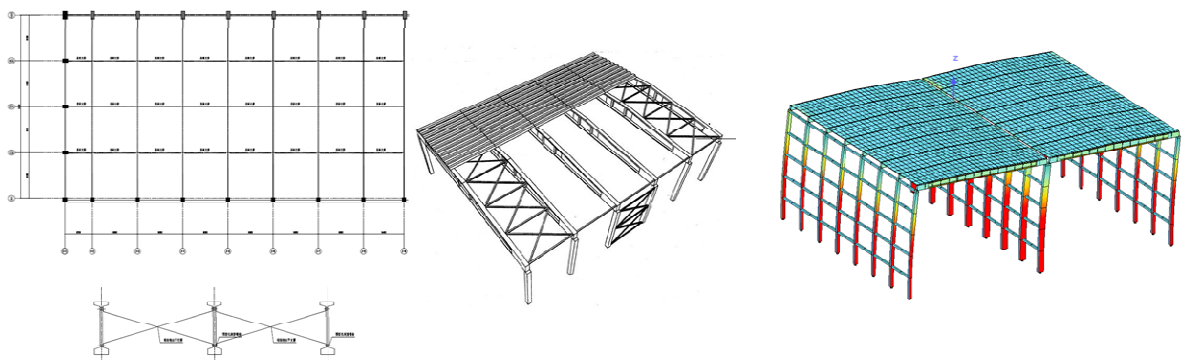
Global view of the building with lateral roof stability built with steel elements
